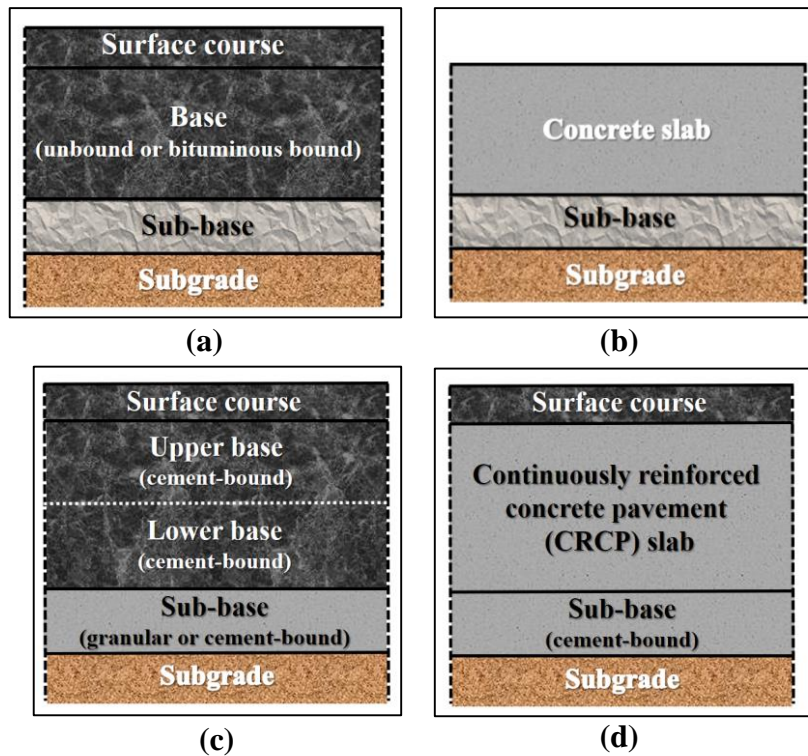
Typical cross section for: (a) flexible pavement structure, (b) rigid pavement structure, and (c) flexible-composite structure, (d) rigid-composite structure.
